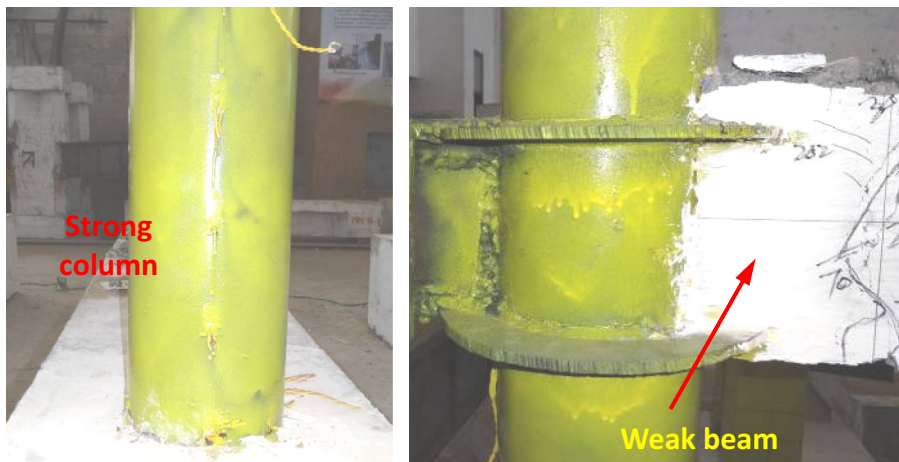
RACFST plane frame: failure pattern (Chen et al. [68]).
